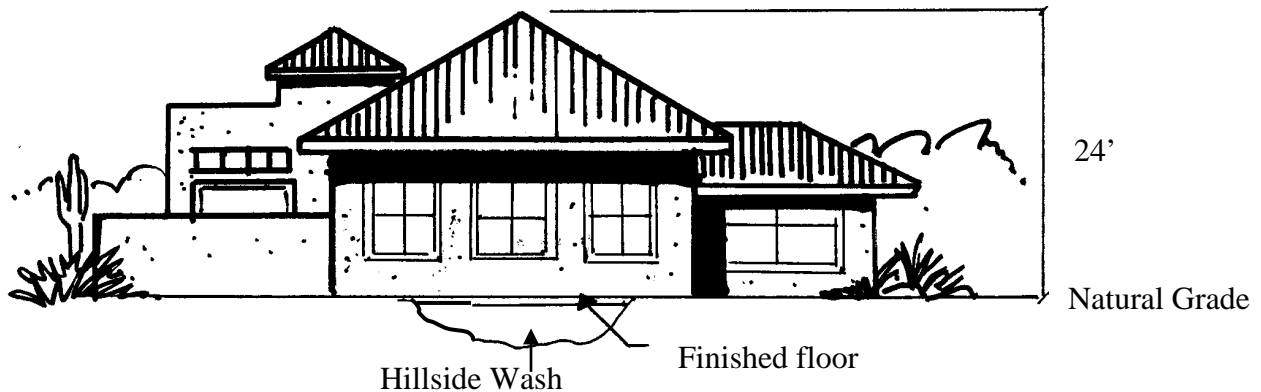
A – ACCESSORY BUILDING HEIGHT LIMIT
